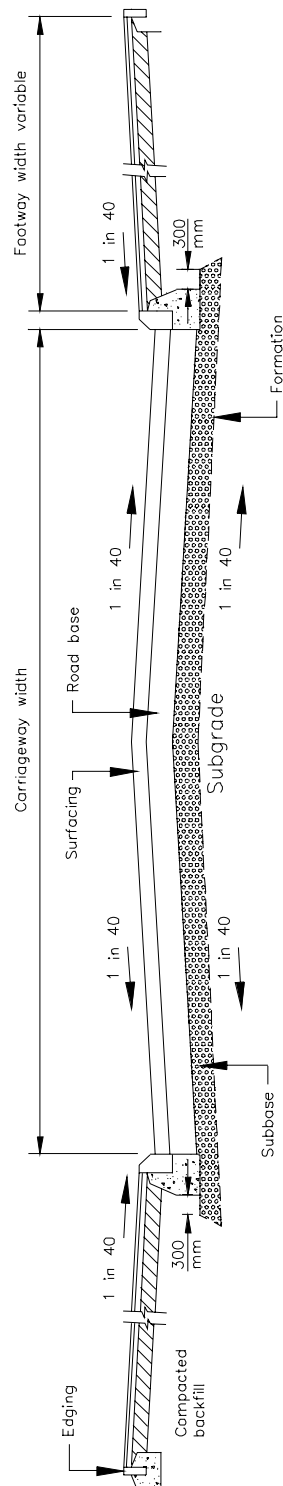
Typical flexible bituminous split crossfall carriageway cross section
